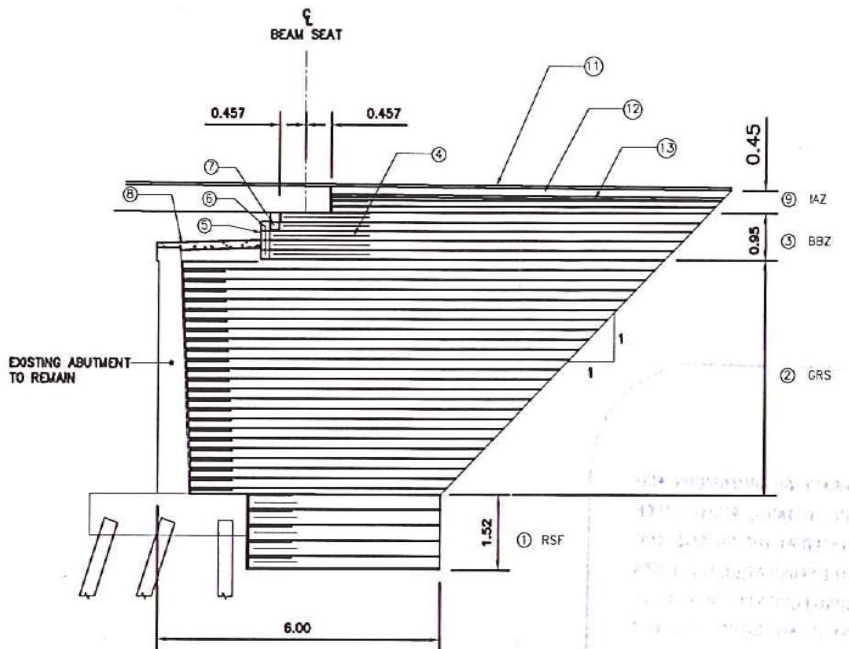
Diagram. GRS abutment section view of Bridge No. 1828.
